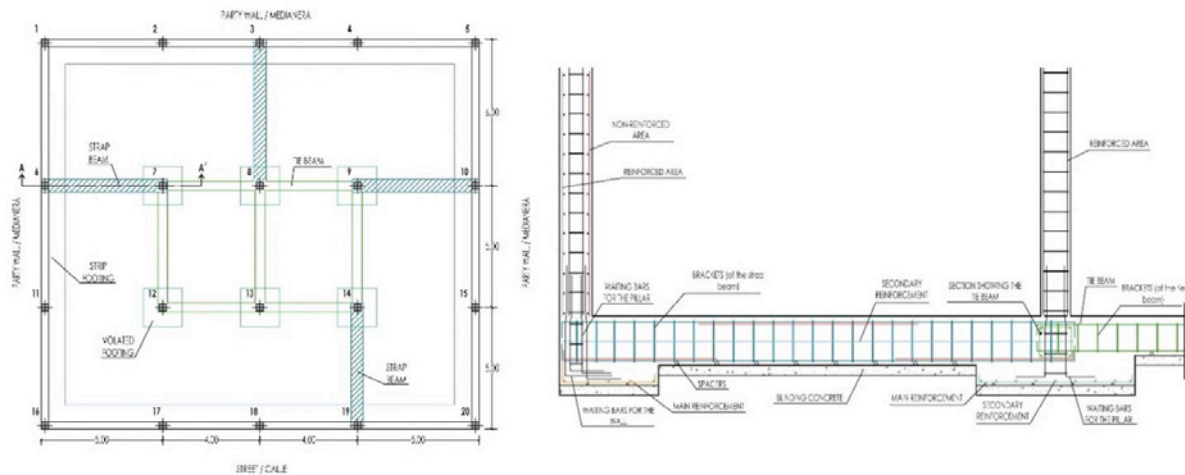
2D Representation. Foundation details made by students in the actual practical classes.
